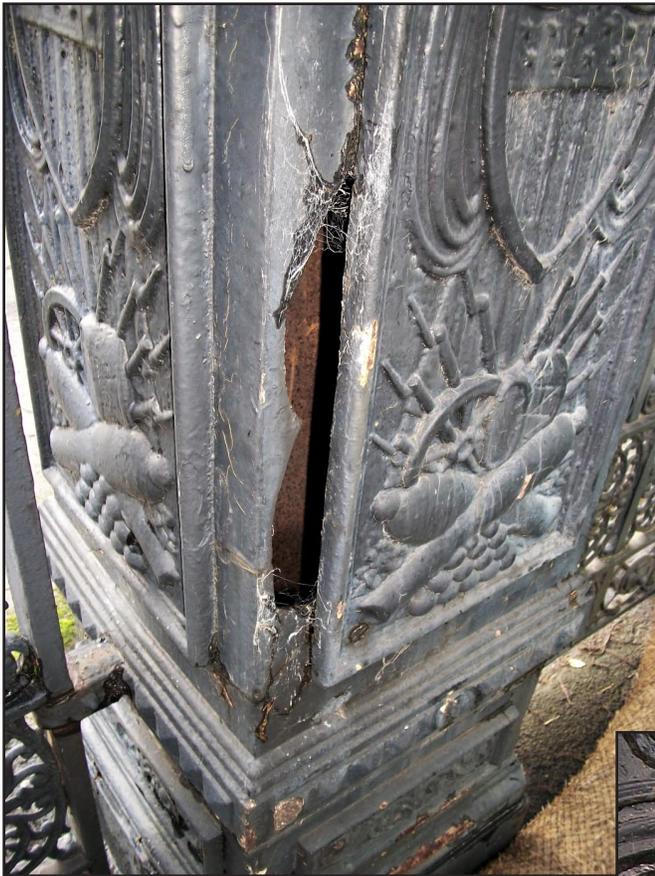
Severe corrosion at corner of gate post, facing northeast.
